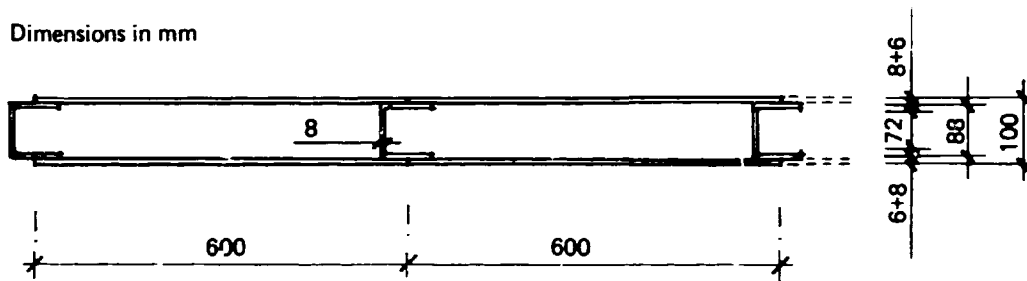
Figure XX. Example of a wall system using prefabricated beams and sheets of sisal-fibre concrete
